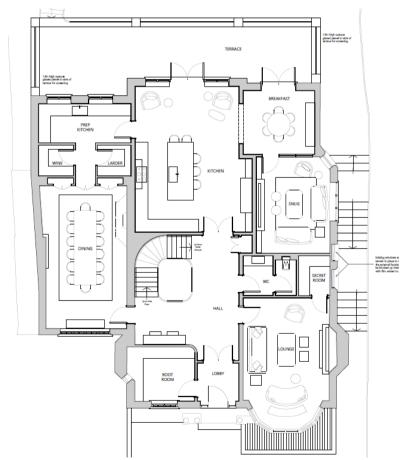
Proposed ground floor plan showing the residential ancillaries.
